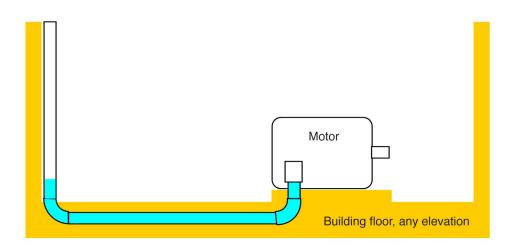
Embedded, Non-Drained Duct or Conduit
